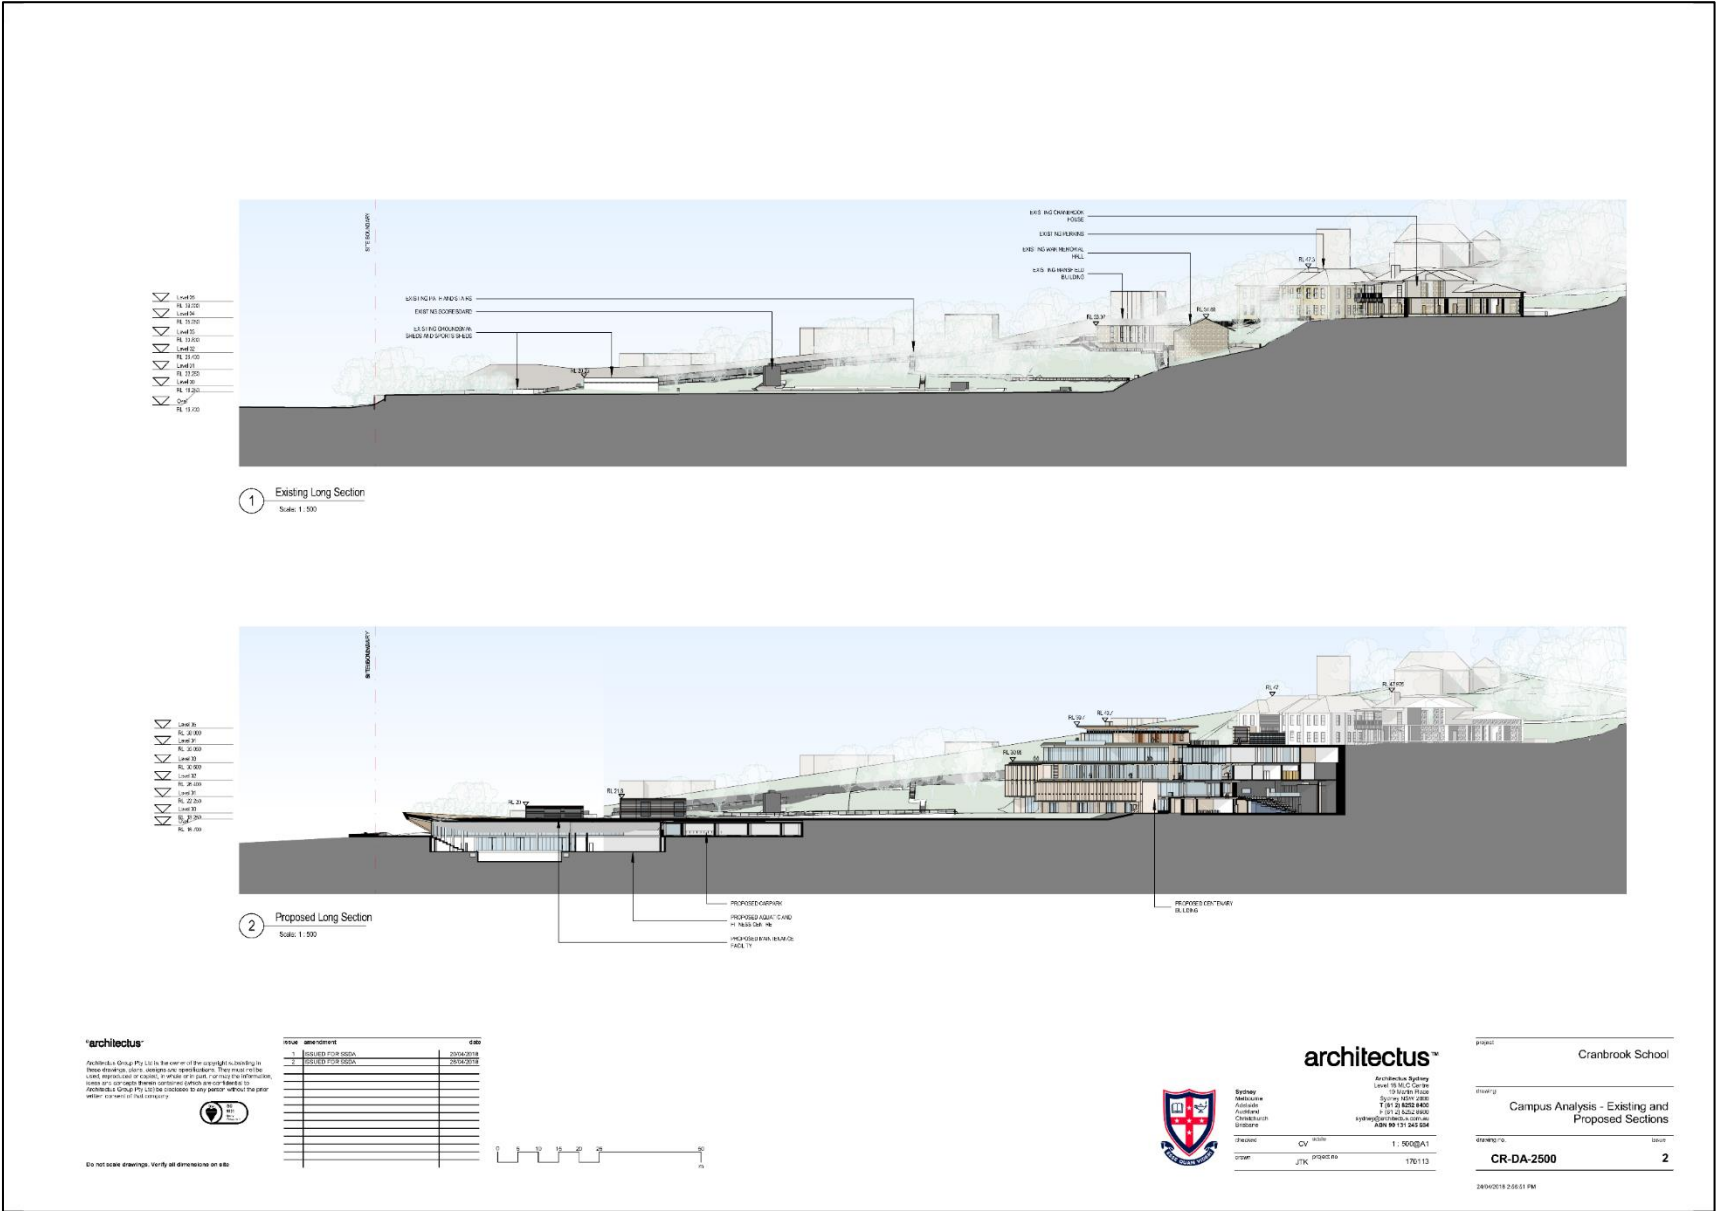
Showing existing and proposed elevation sections for Cranbrook (plan courtesy of architectus).
